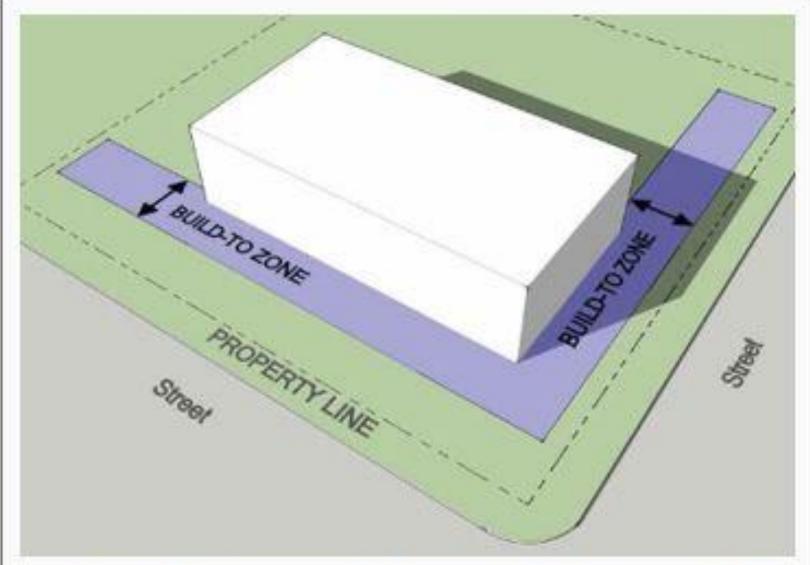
Build-To Zone. Both road frontage facades shall be placed within the build-to zone, which has a minimum and maximum distance from the property line.
